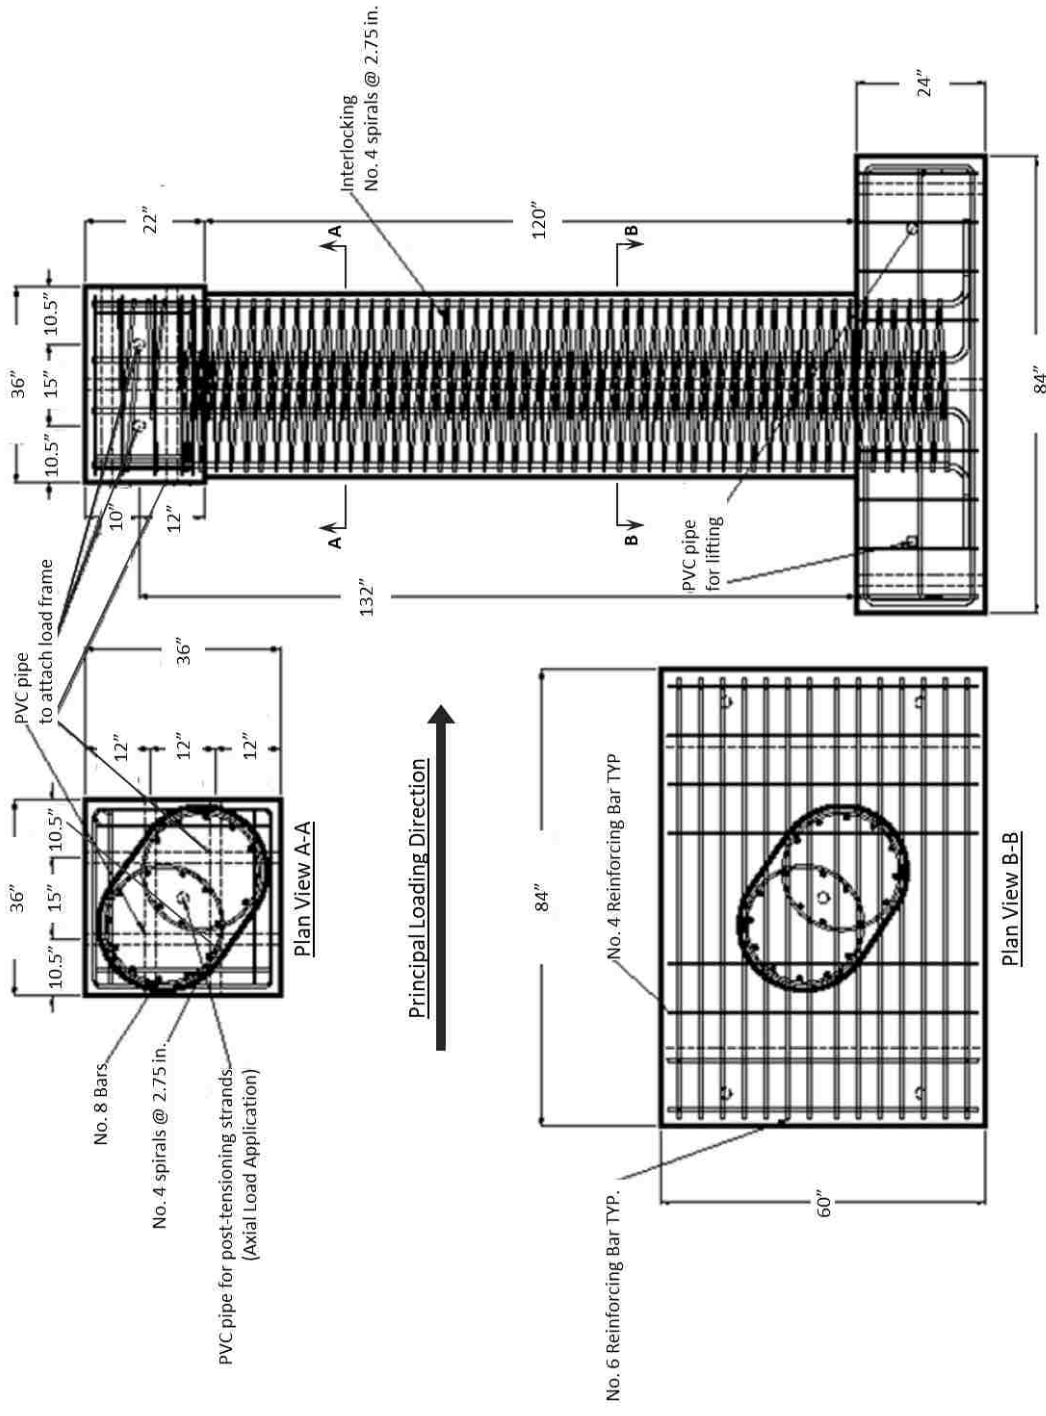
Geometry and Reinforcement Details of Calt-3 (1 in. = 25.4 mm)
